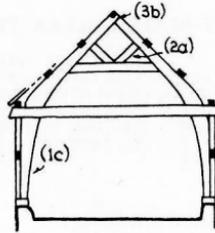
Types of Wind-Brace (From Trusses to Side-Purlins, Wall-Plates, or Ridge-Purlins).
